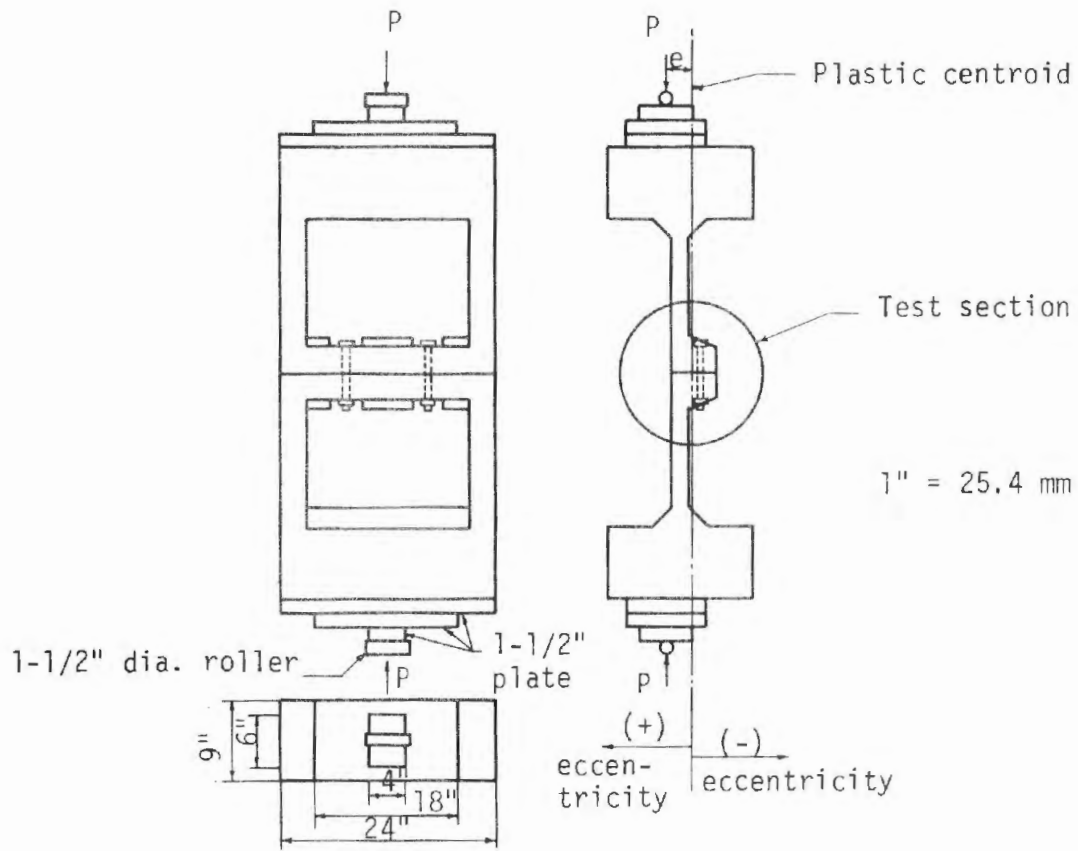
TEST ARRANGEMENT FOR CONCRETE SEGMENT JOINT TESTS
